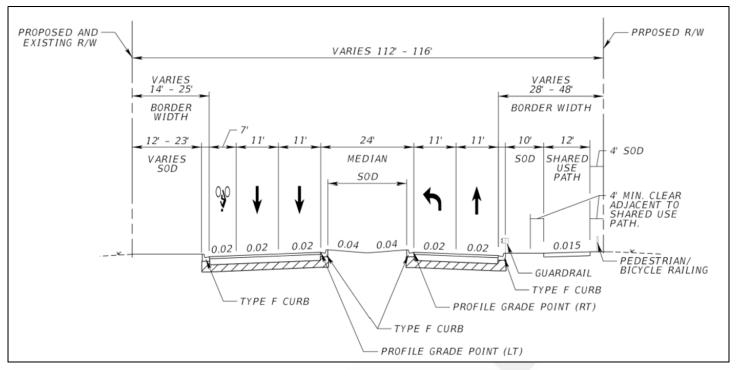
Proposed Typical Section for Aviation Boulevard
